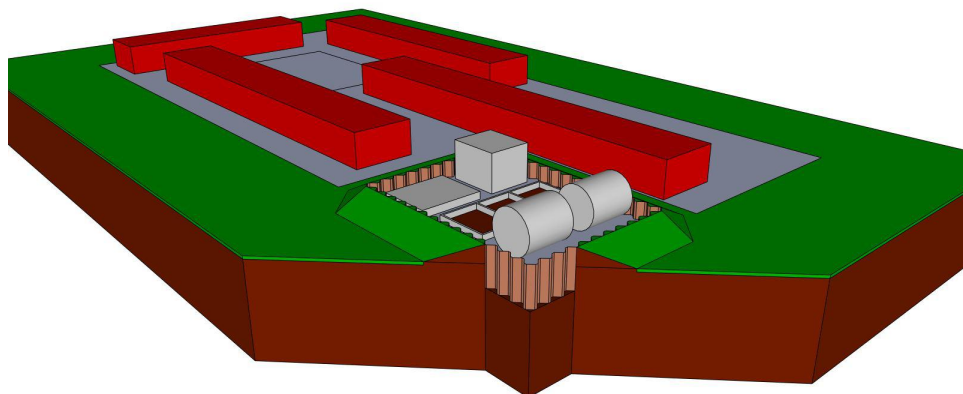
3D schematisation of the sheetpile wall around the waste water treatment plant
